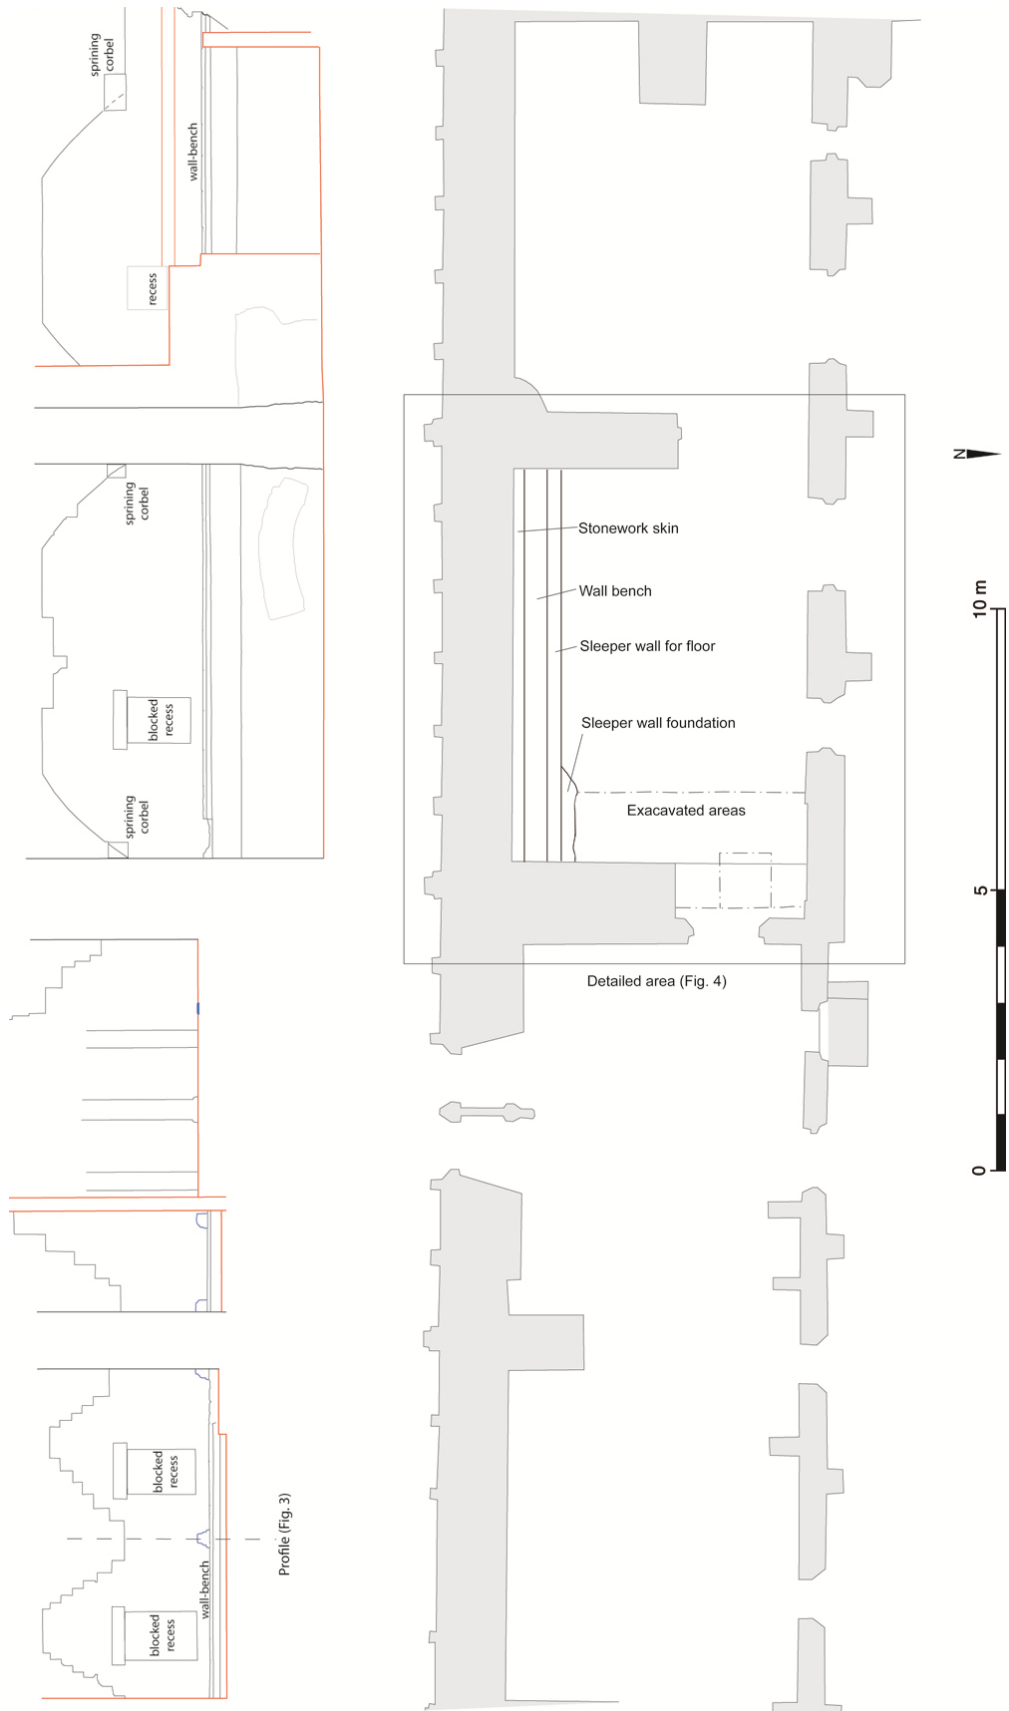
N facing elevation of former range in relation plan of existing. Red = modern works
